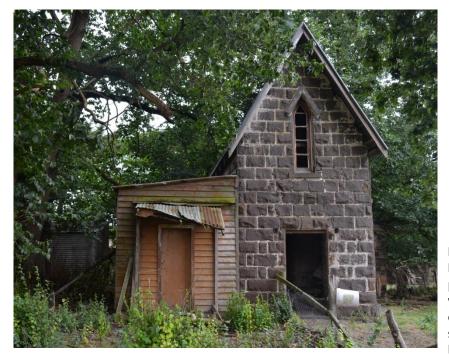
Dunmore Turkish Bath House, front, showing portal and highlight window and timber skillion extension built on western side, view facing north Photo: C. De Leiuen
